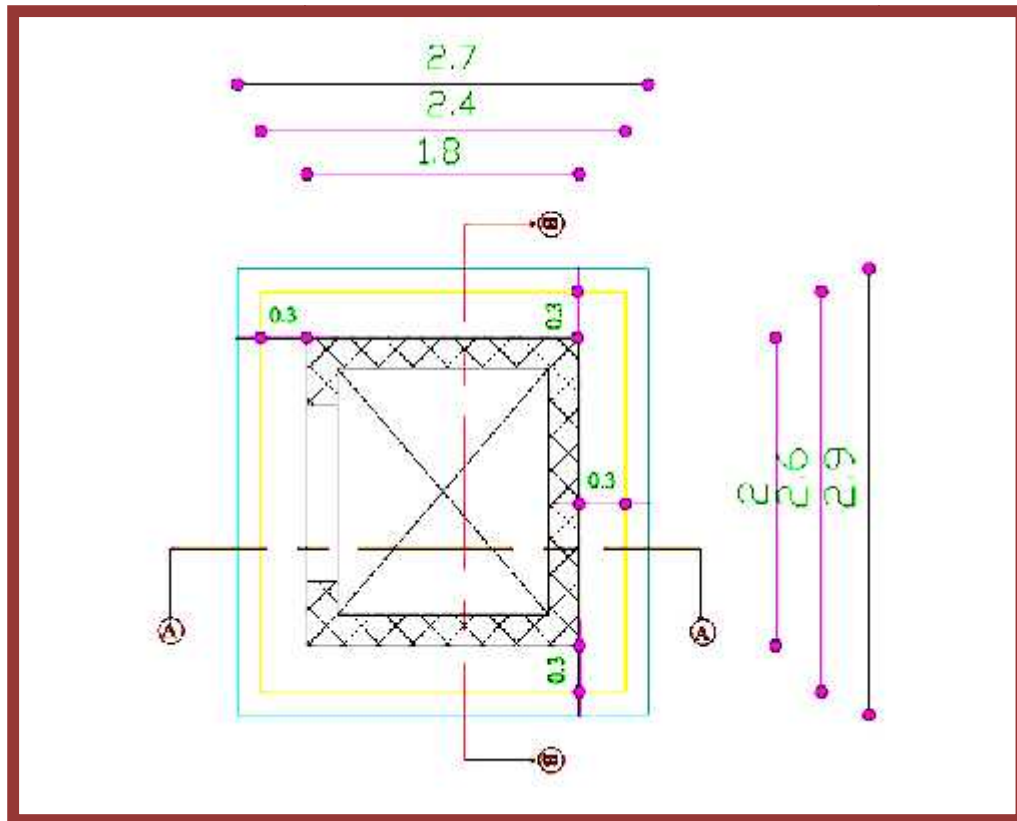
Top view of Mat Foundation(Under Elevator)
